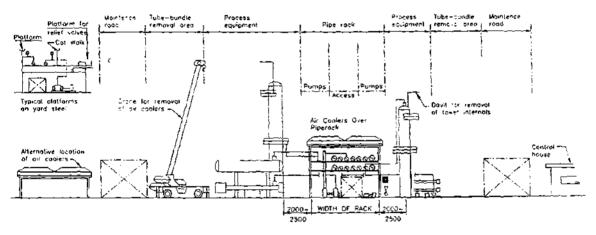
TYPICAL CROSS SECTION OF AN OUTDOOR PROCESS PLANT
